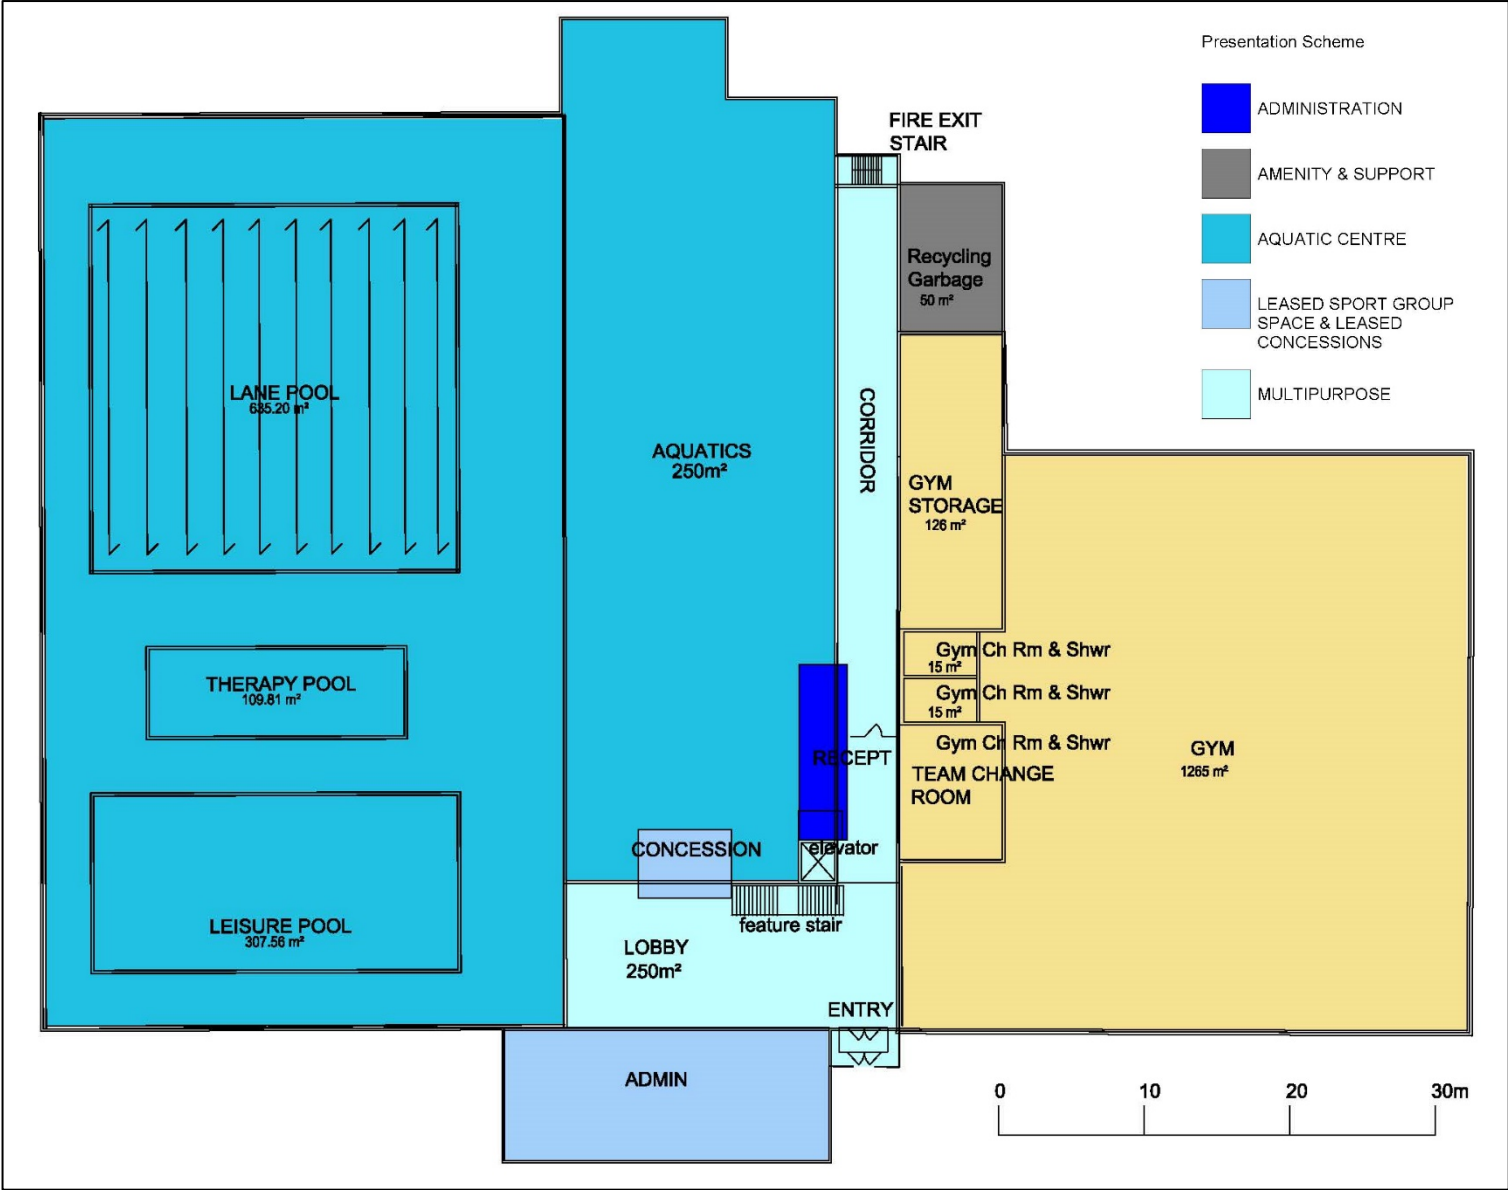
Option 2 – Main Floor Concept Plan (with Gymnasium)
